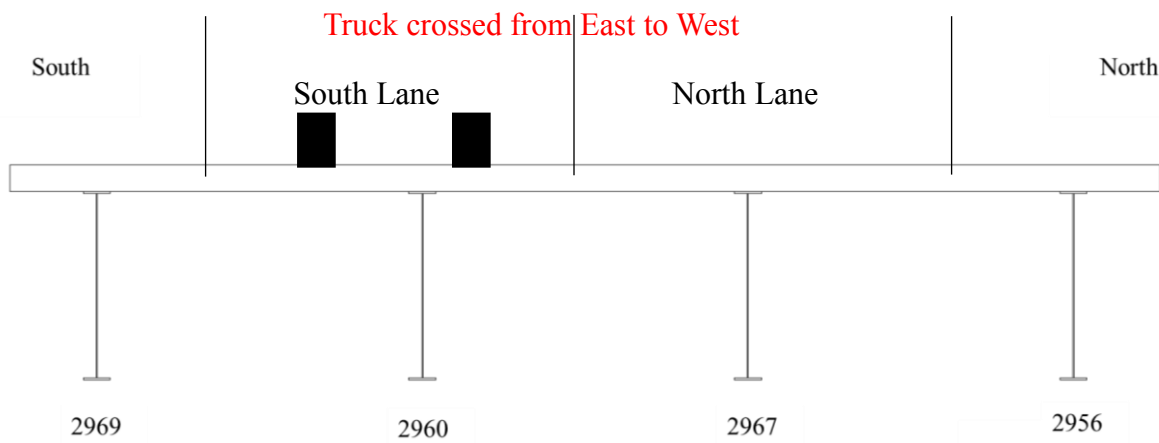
Trucks on short-span steel girder Bridge 23370
